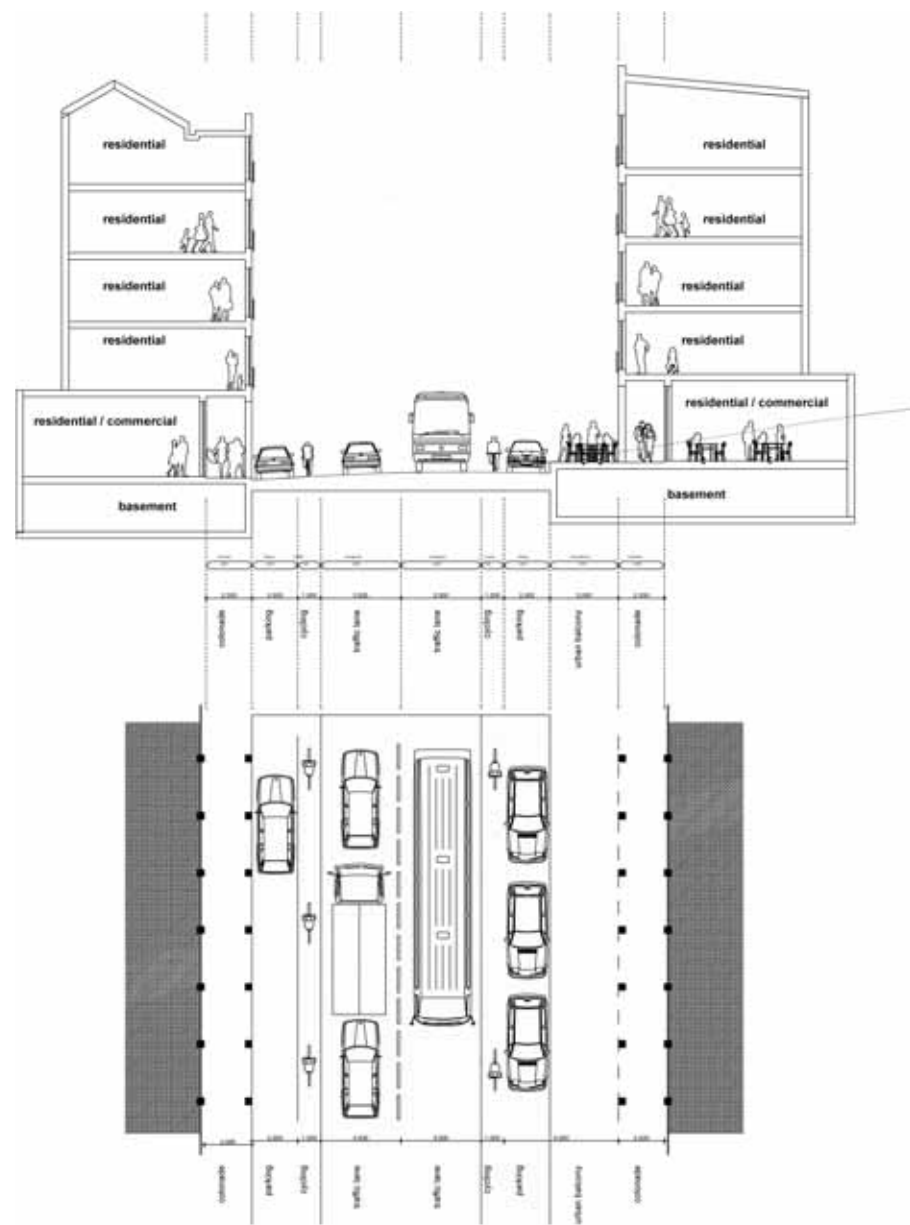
NEW HANOVER STREET PLANS AND SECTIONS
